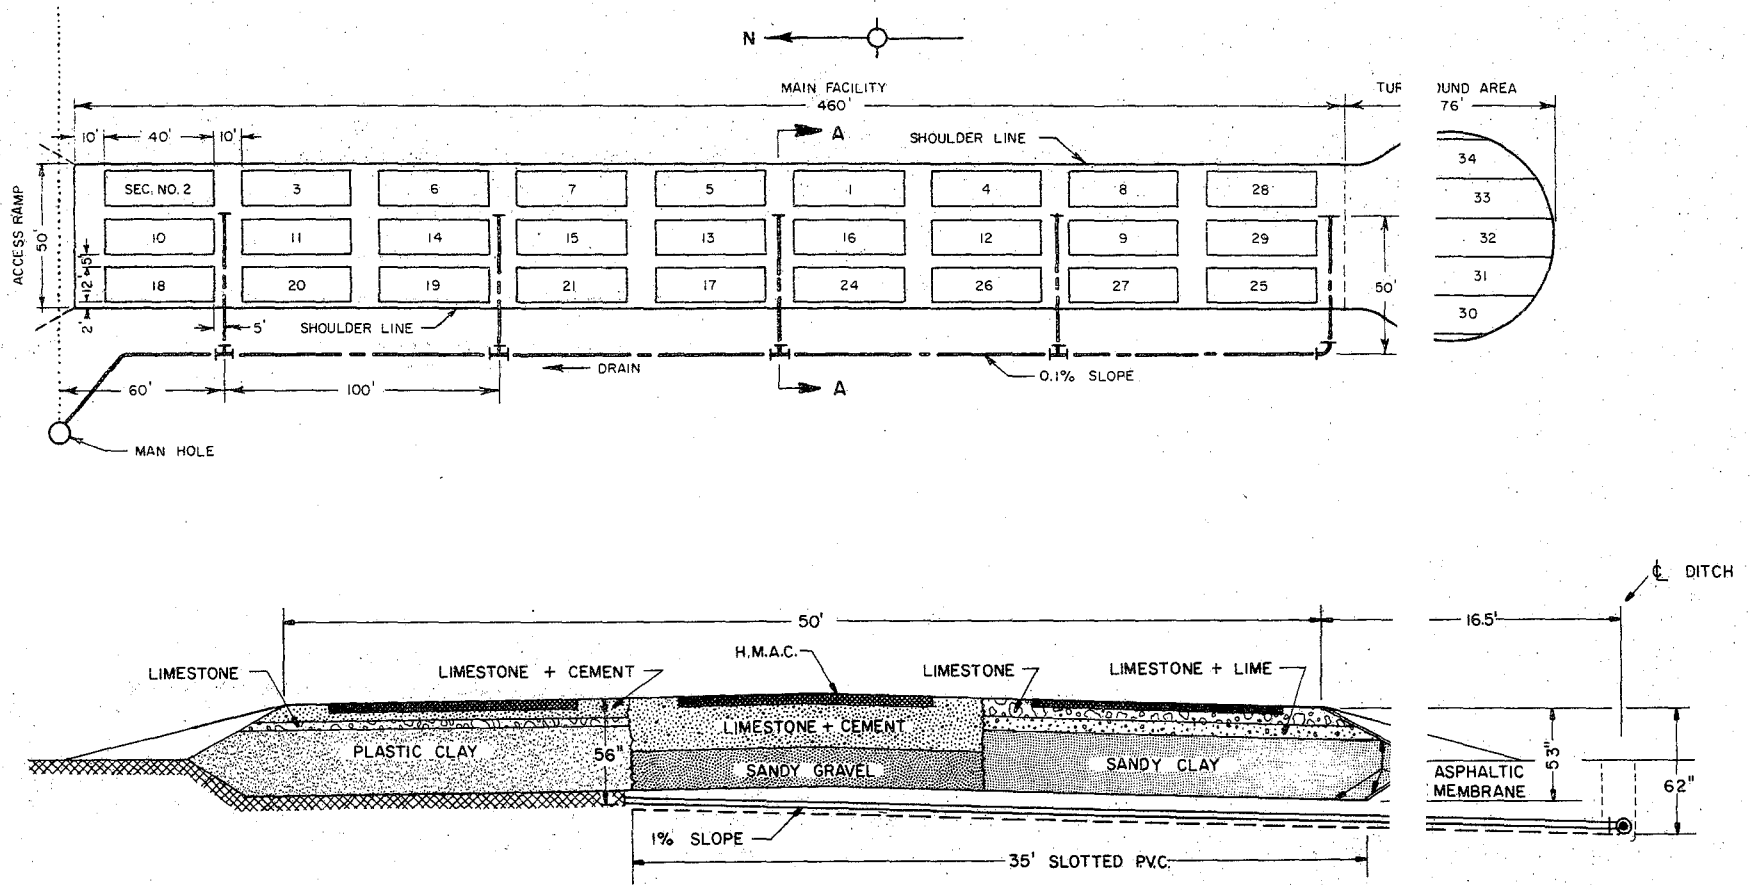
Plan and cross-section views of the TTI Pavement Test Facility after installation of drainage system in the fall of 1961, five years after construction of the facility.
